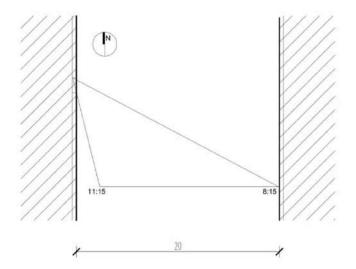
Access of sunlight to the dwelling at the height of the second storey, shown on the floor plan assuming a building height of 14.5 m - Source: Author 2022
